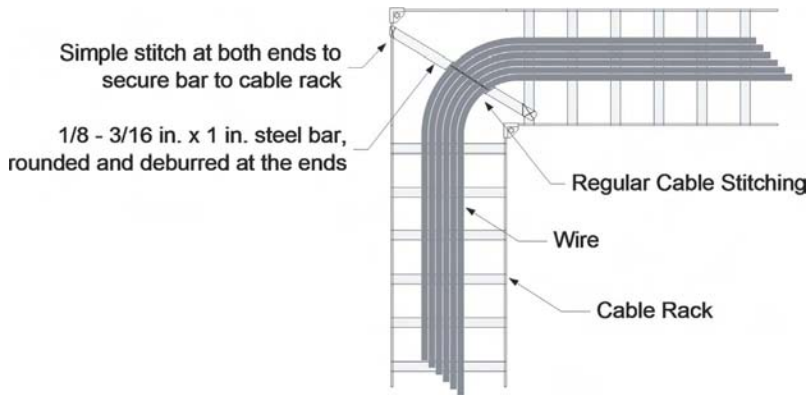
Plan view of wire support at turns and corners using a locally fabricated steel bar.
